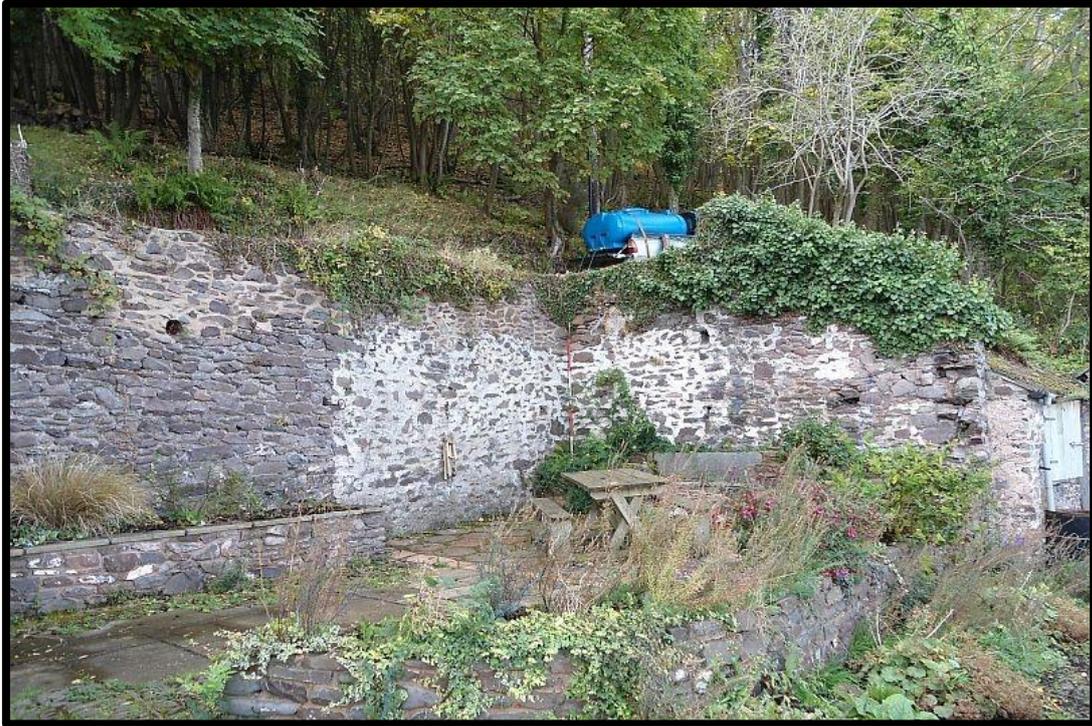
View of the revetment walls to the west of the old farmhouse showing the remains of demolished farm buildings.
